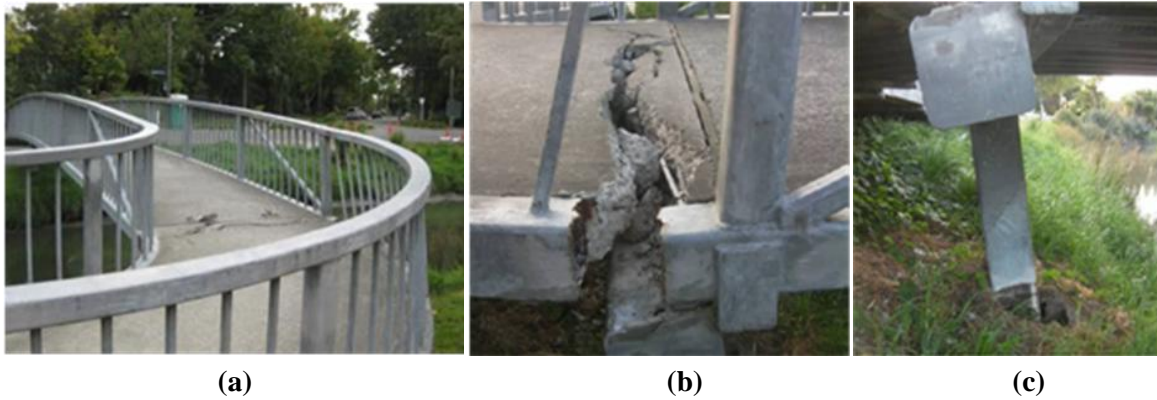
Overall view of some damaged pedestrian bridges after February 22, 2011. a) Dallington Bridge (Snell Place); b) Porritt Park Bridge; c) Fifield Terrace Bridge.
